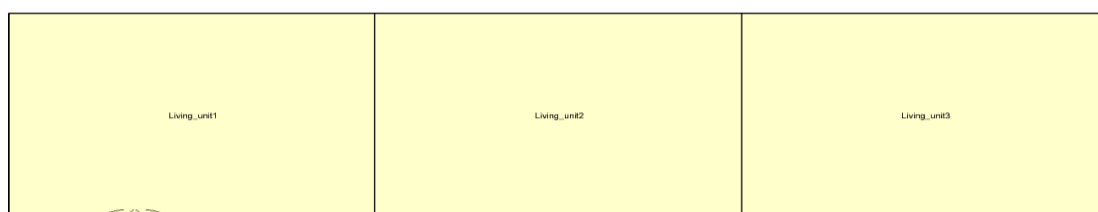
Plan view of the last floor and one row consisting of three-units of mini-flats
